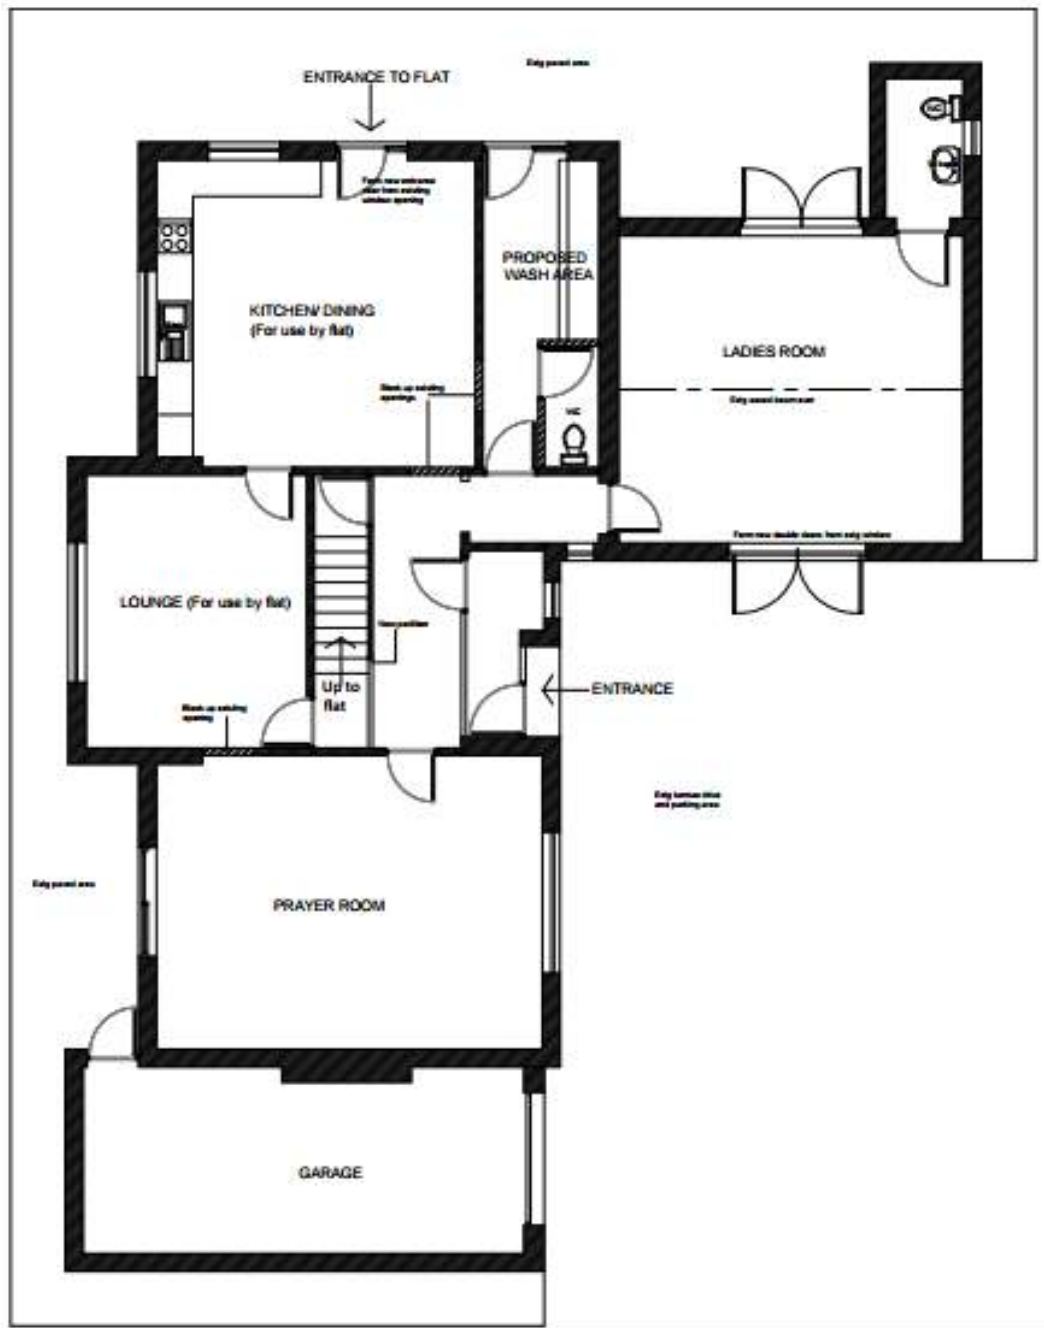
Proposed internal layout of ground floor (not to scale) Source: Compass
